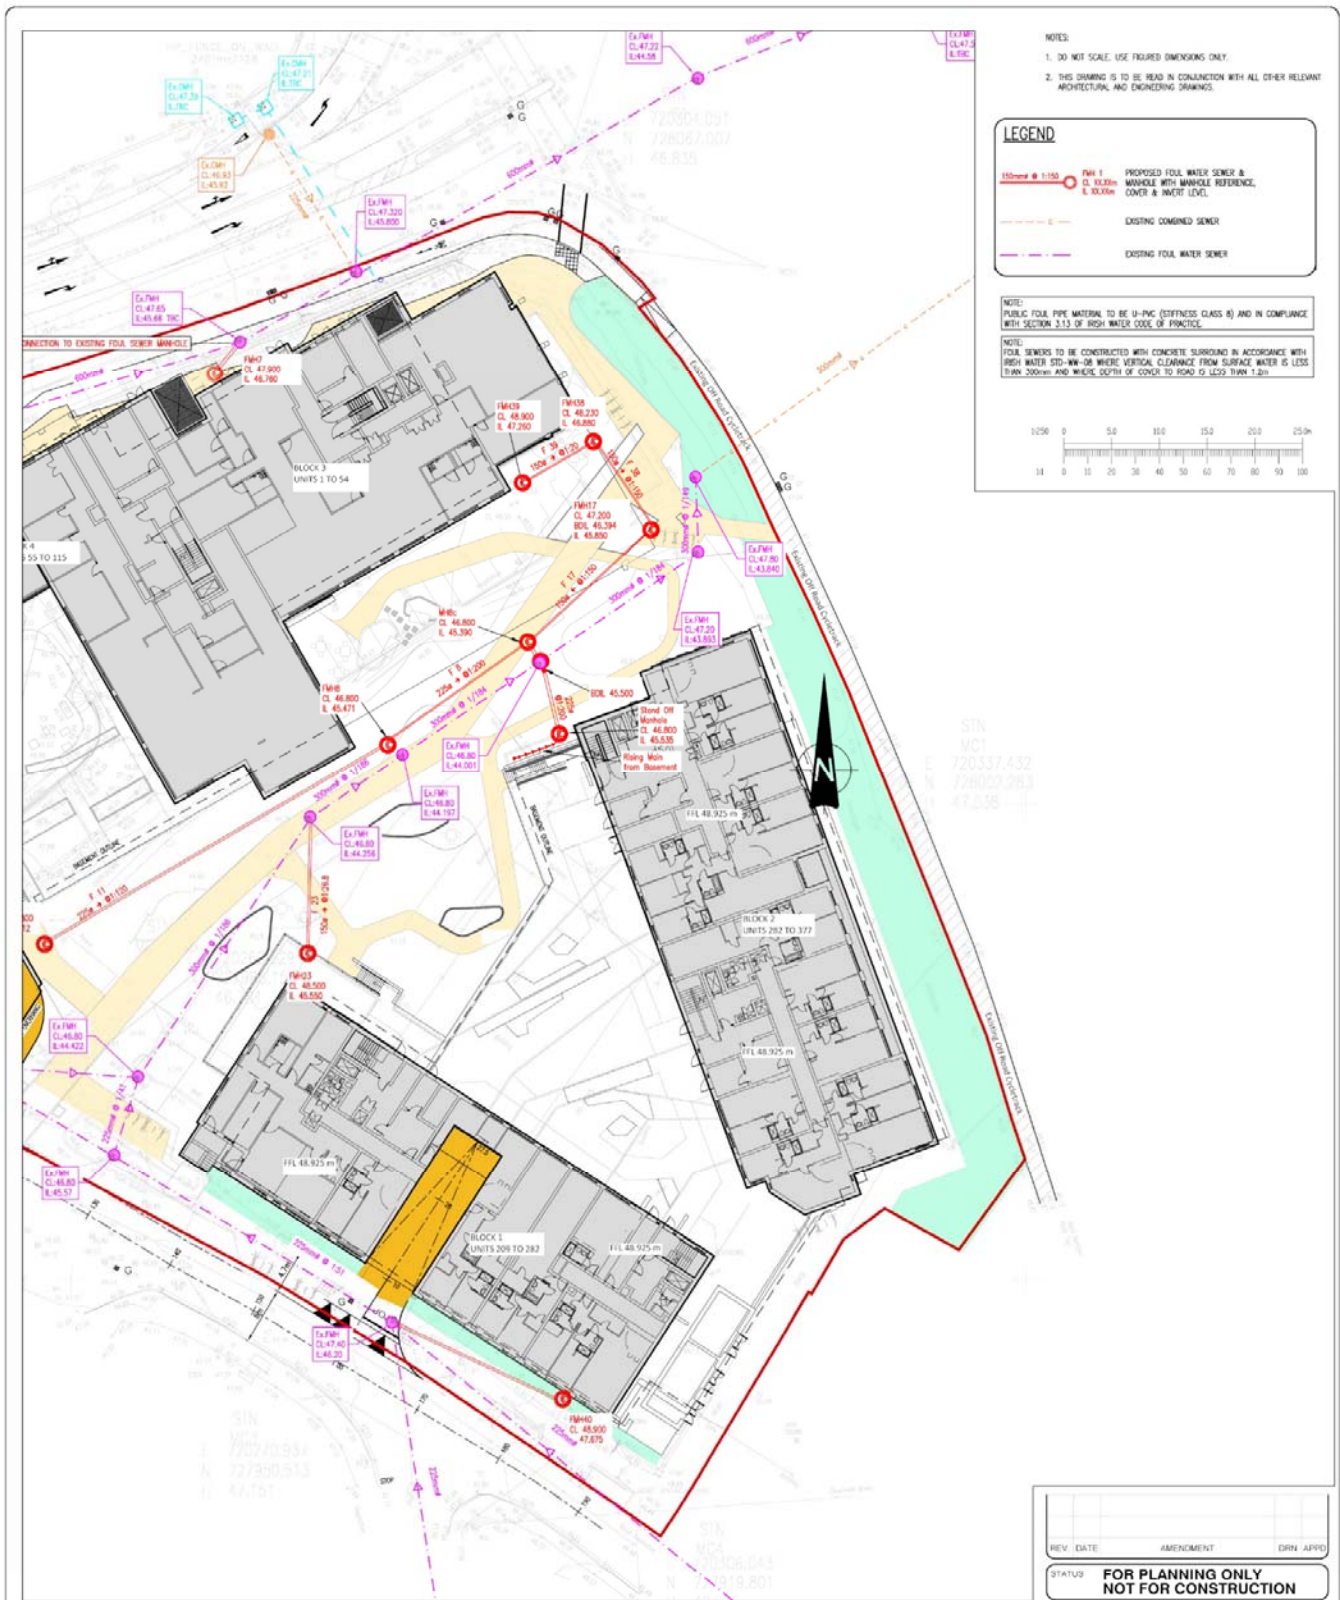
Proposed Foul Water drainage layout (Sheet 1)
